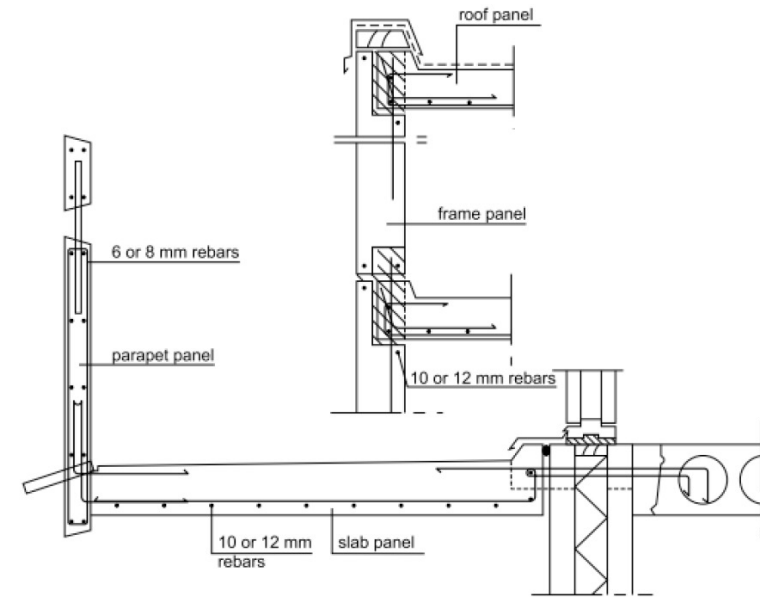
Cross-section of a typical Finnish balcony made of precast structural members (Pentti 1994).
